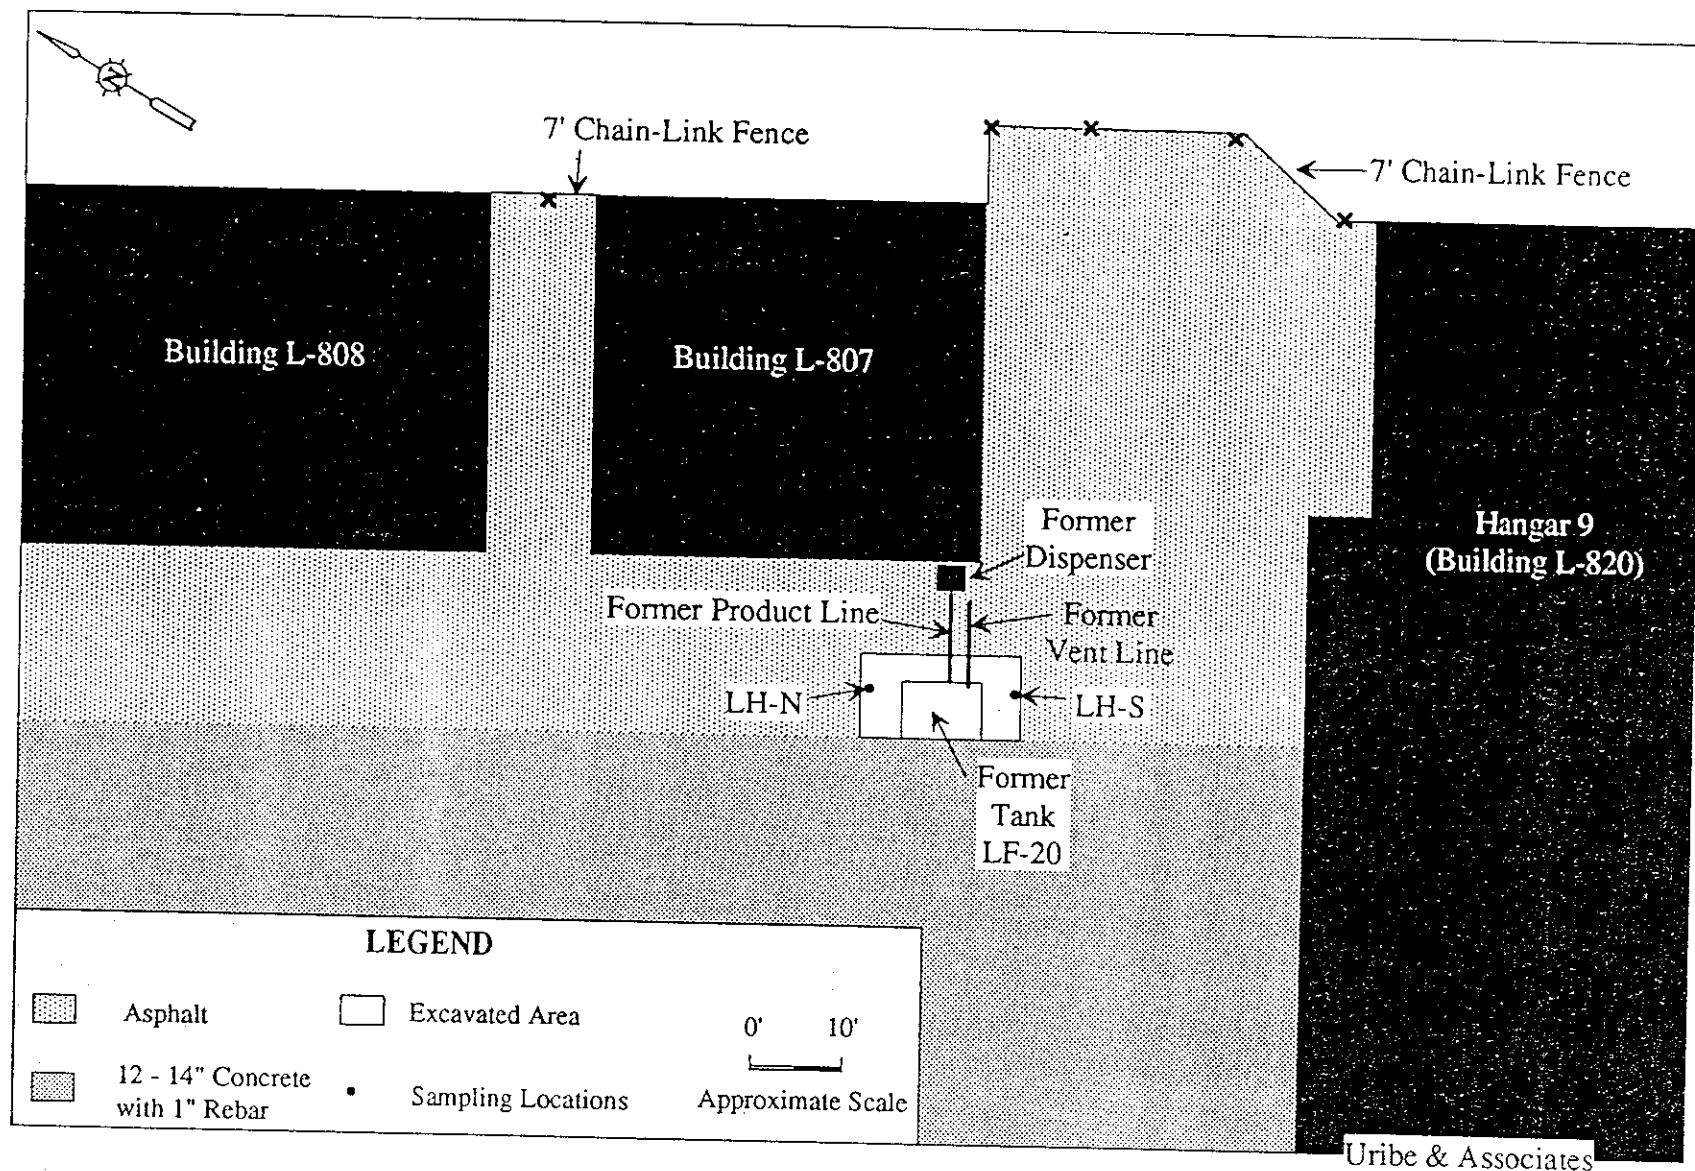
B: Plan View of Sampling Locations and Extent of Excavation at Tank LF-20
